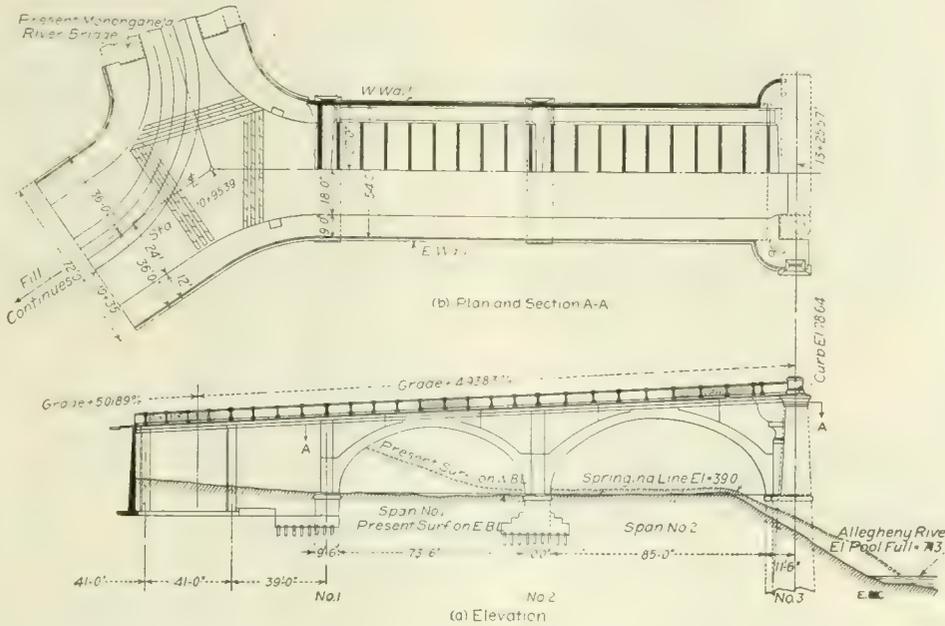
Arch Spans and Y Connection of Solid Fill of South Approach of North Side Point Bridge.
